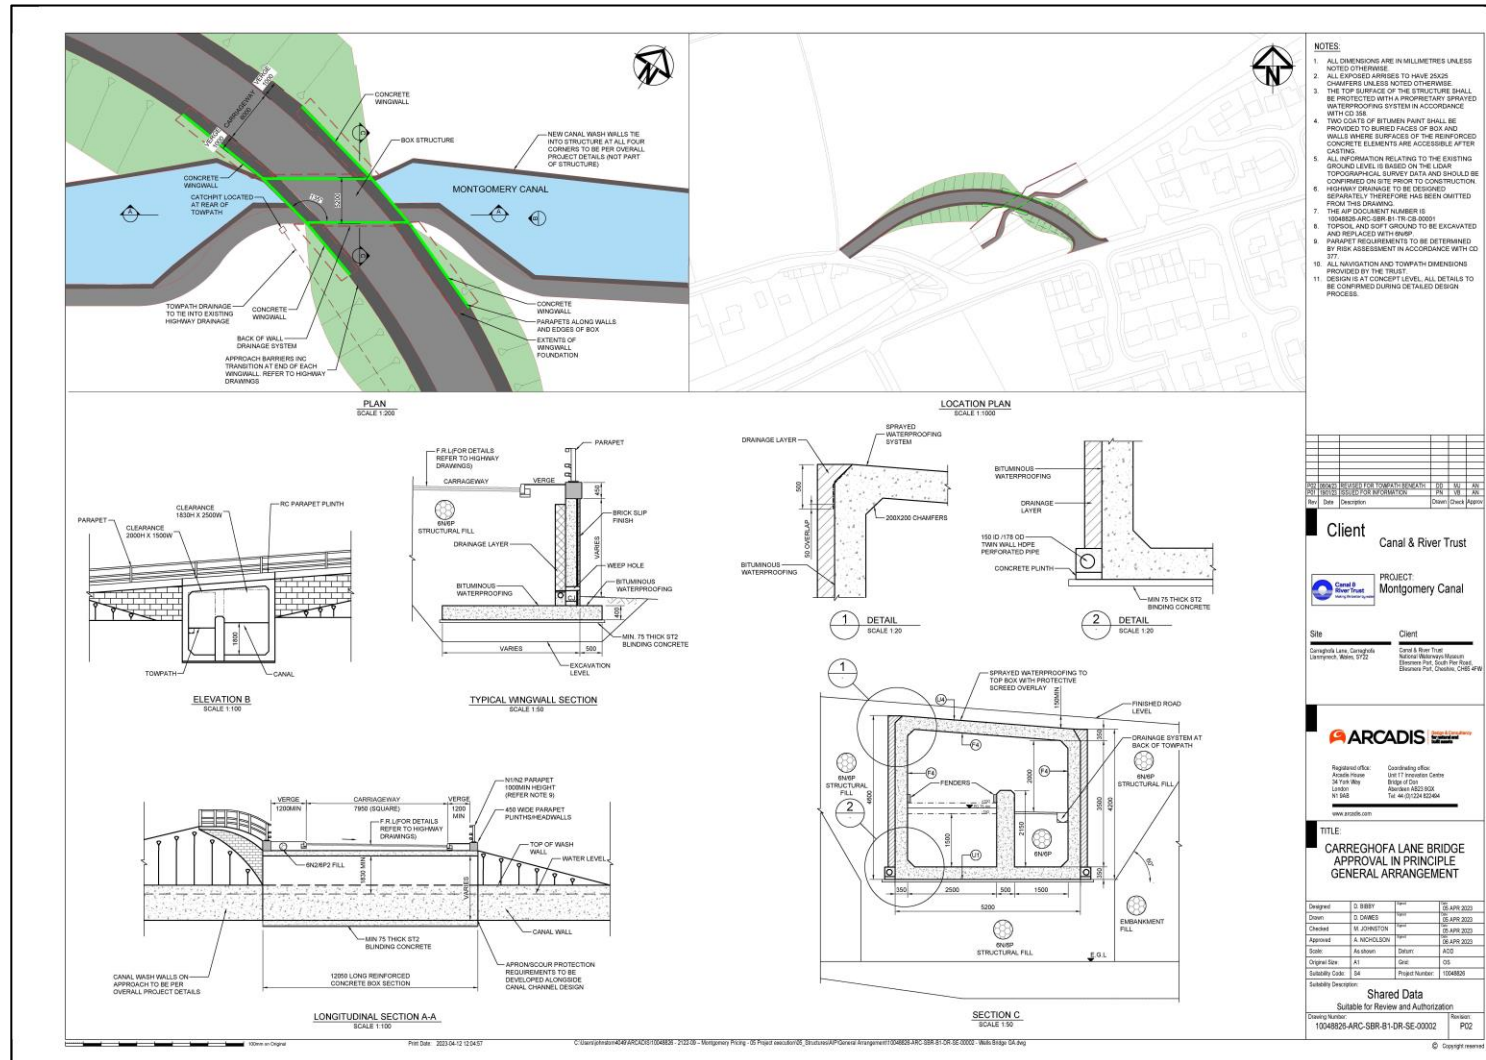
General Arrangement Plan of the proposed bridge (reproduced courtesy of the client)
